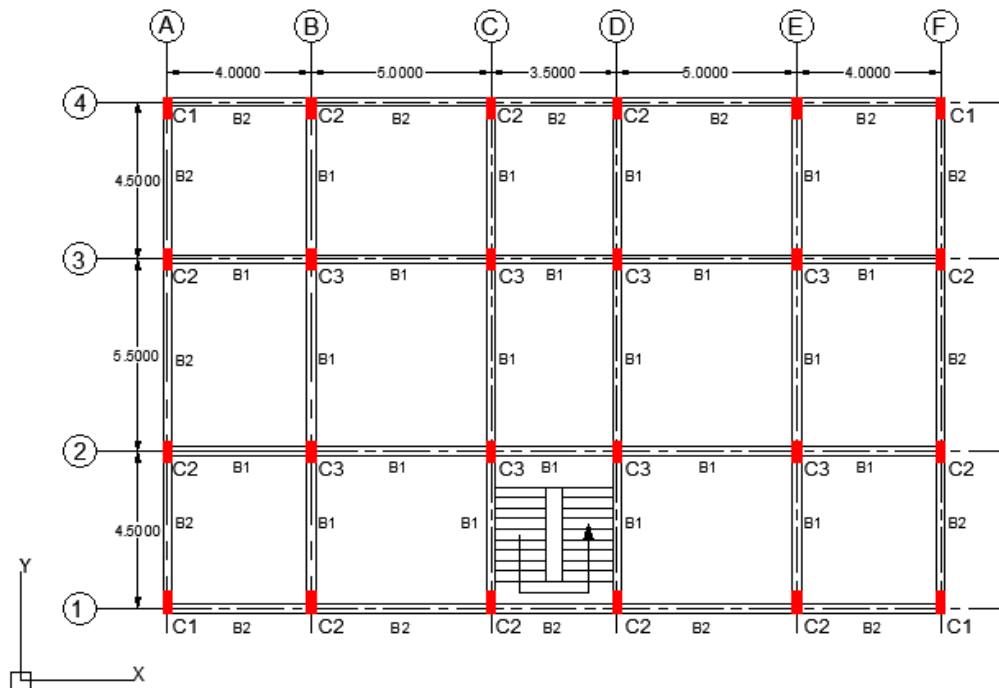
Floor plan for five story moment-resisting frame in regular form
